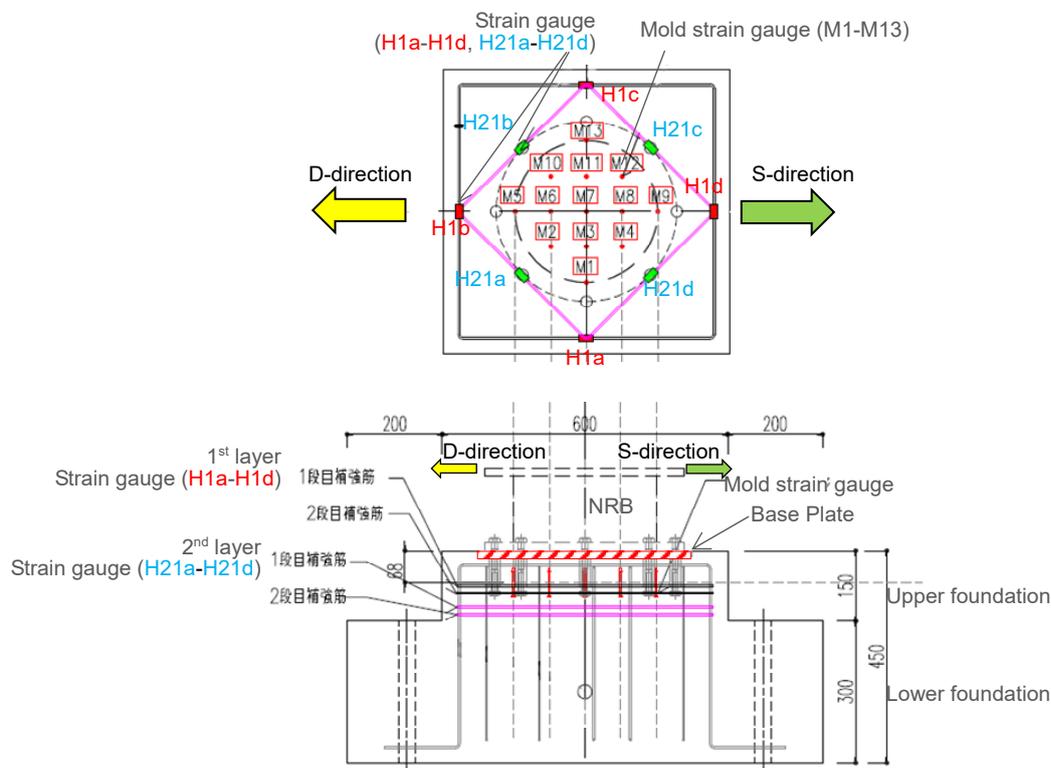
Reinforced concrete foundation specimen No.2 (unit: mm)
